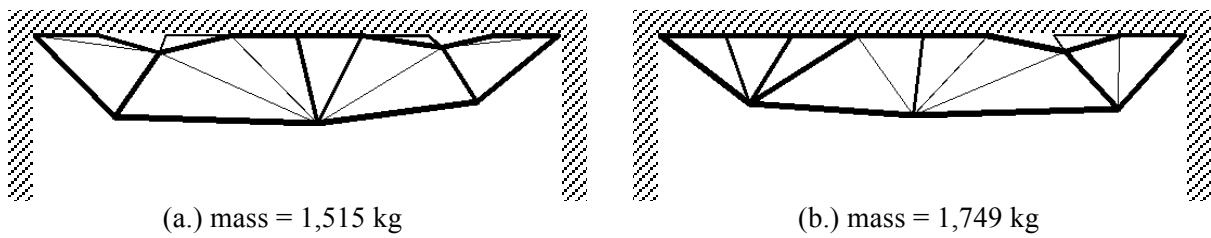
Roof truss layout for 7 fixed load points and depth = 1/6 span
